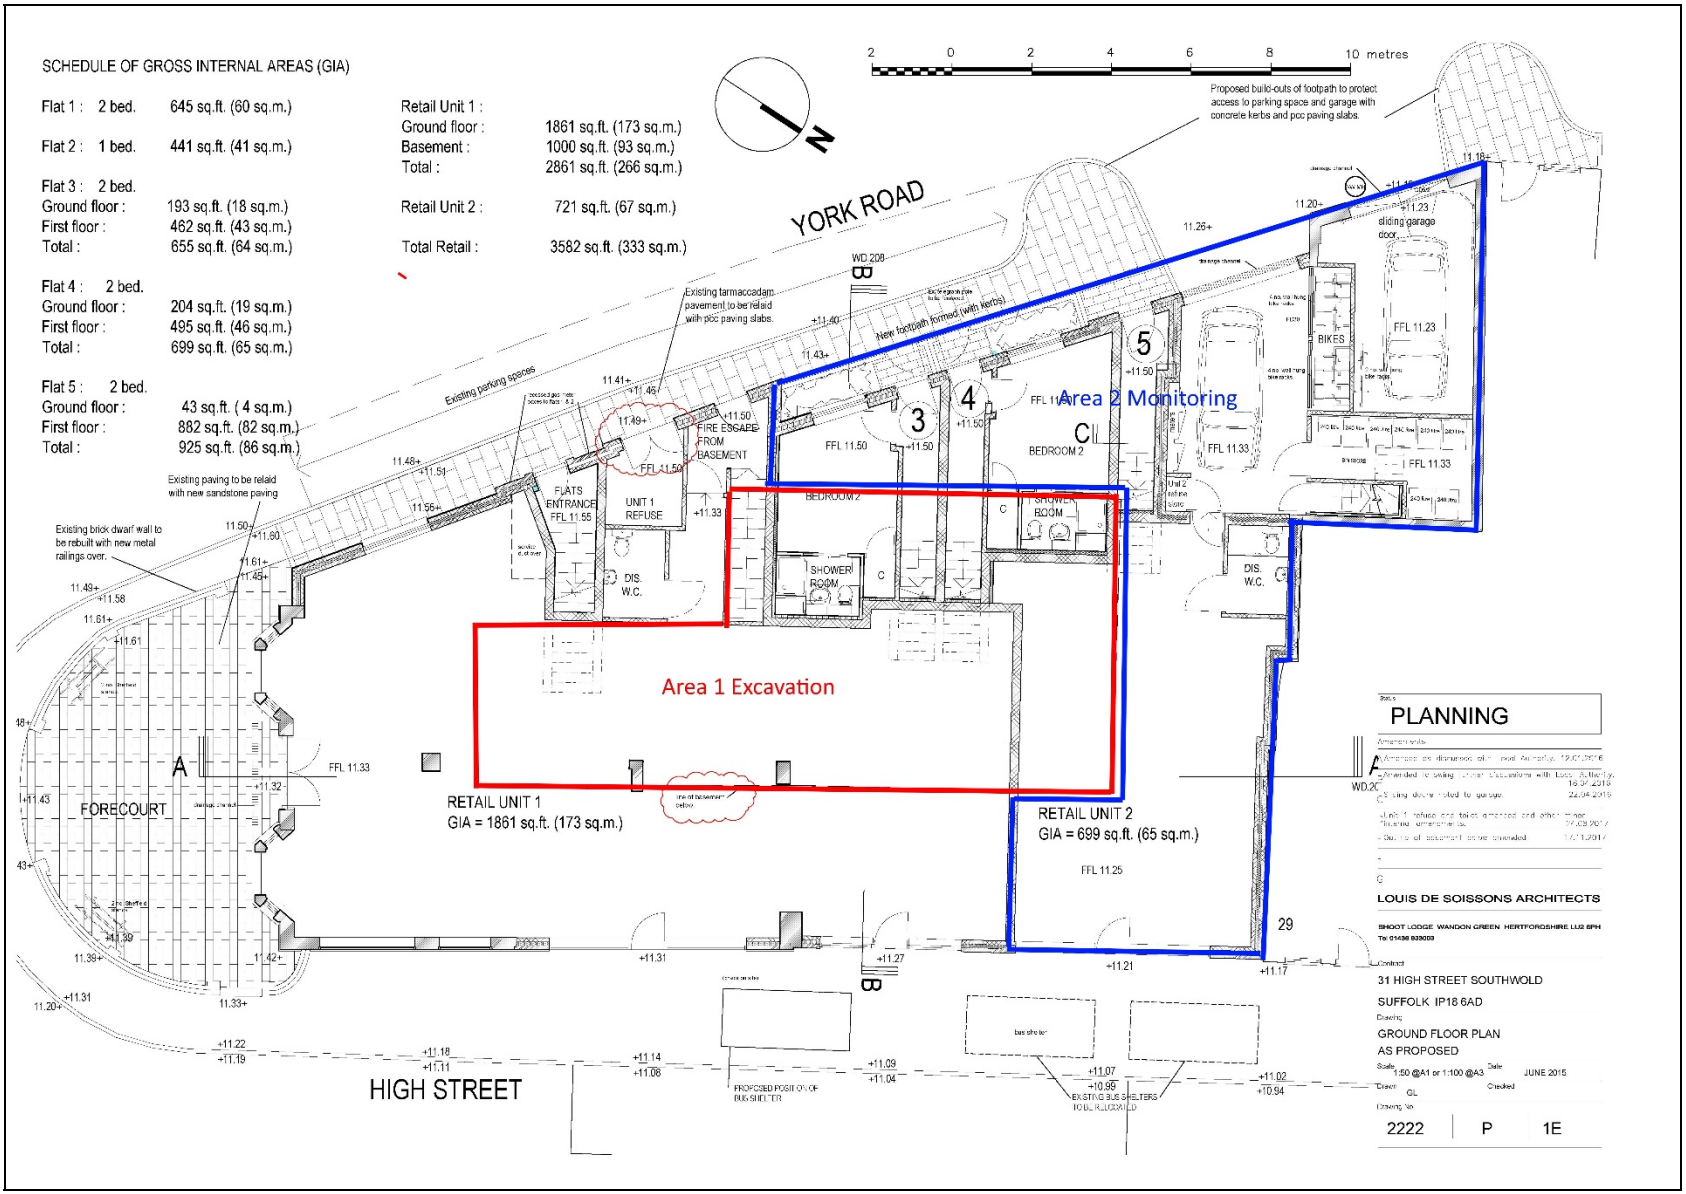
Excavation area plan, as shown on architect proposals (Dec 2017)
